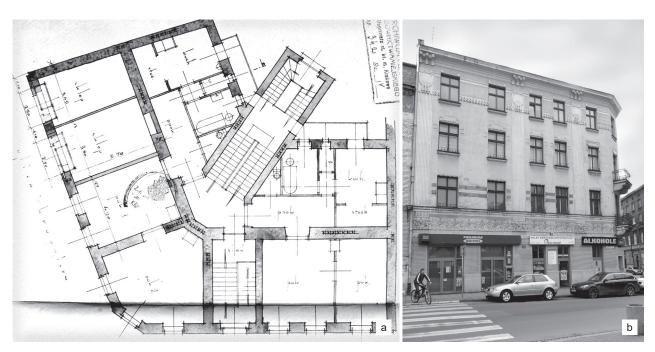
Townhouse at 30 Krupnicza Street / 2 Garncarska Street (designed by K. Zieliński, 1906–1908): a) ground floor plan (source: ANK, ABM Krupnicza 30, fsc. 253), b) façade (photo by B. Makowska)
